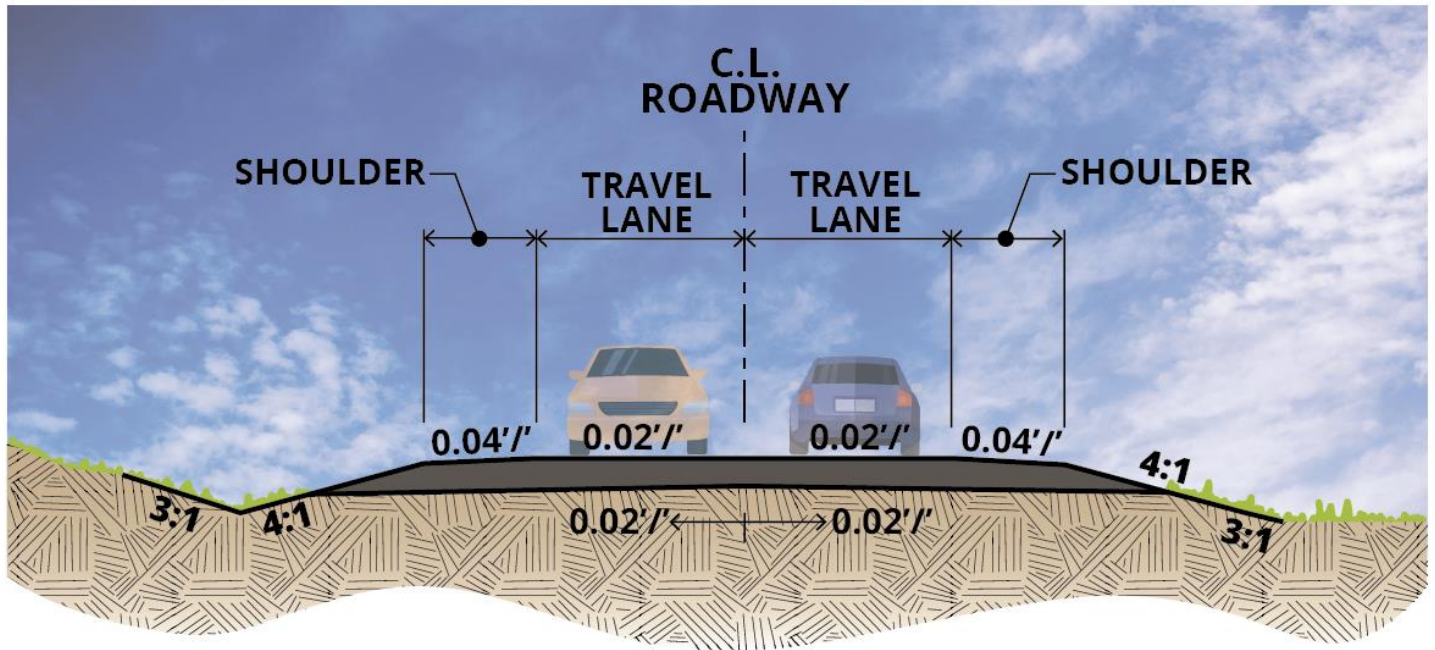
Typical Section of Alternative H Ramps and Interchange Alternatives 1, 1A, 2, and 3
